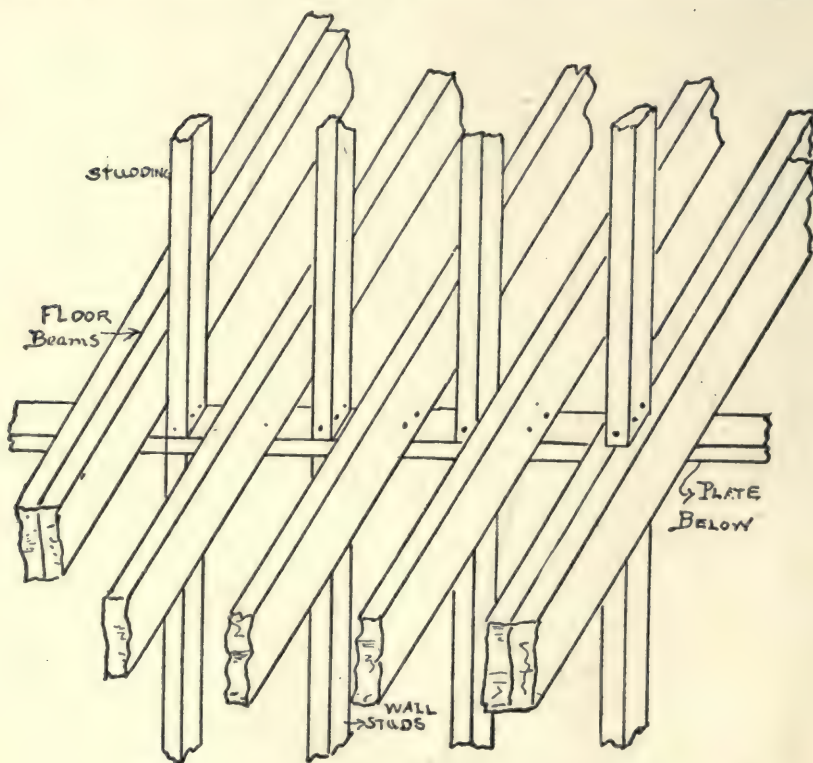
Section of a Fore and Aft Stud Partition at Floors.
